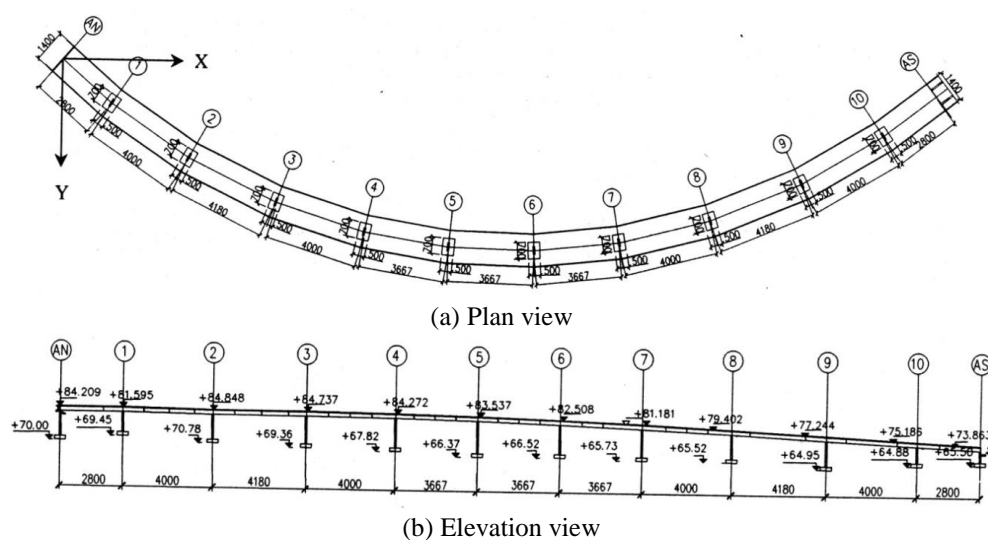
Kozyatagi bridge (all dimensions in mm)
